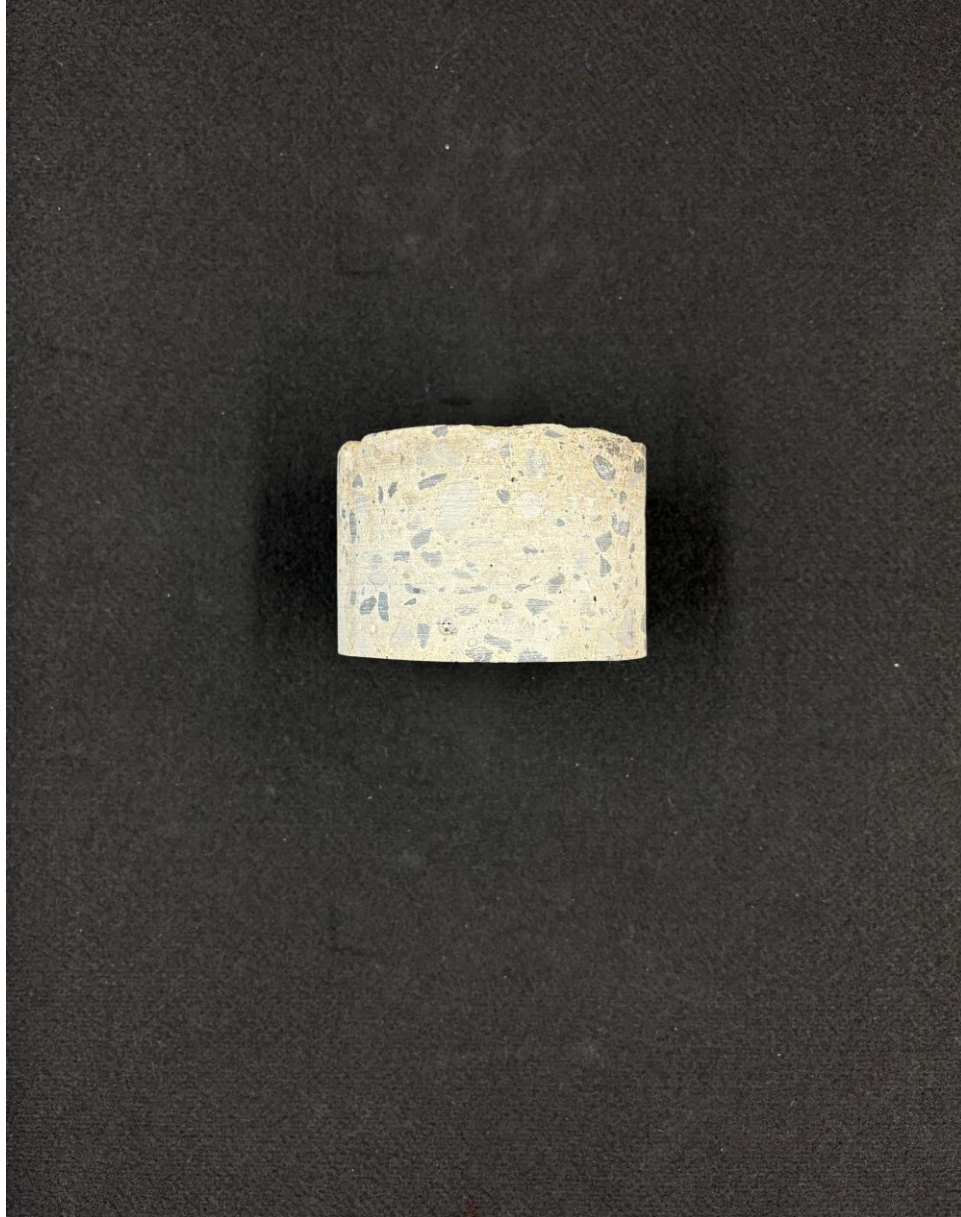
Core 4 of lightweight concrete deck at bridge C-1011.
